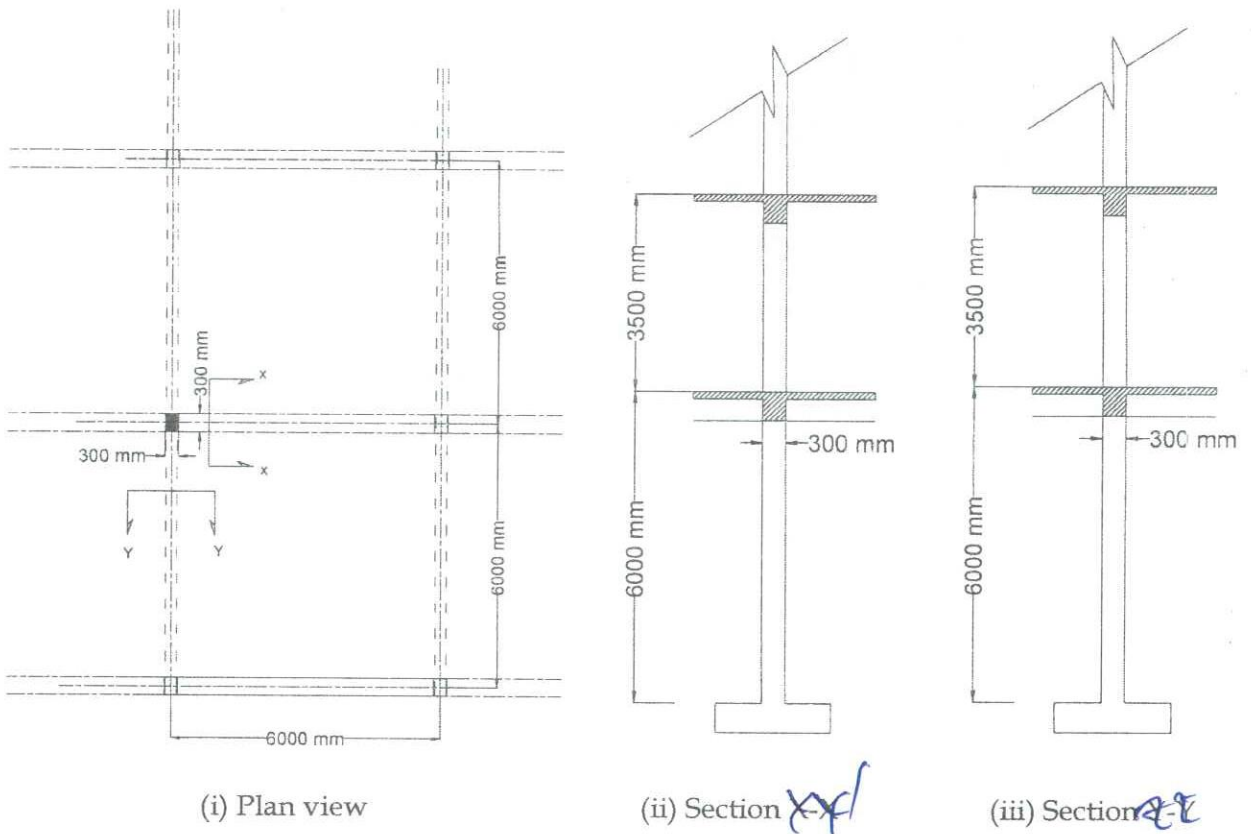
(a) Plan view and cross sections of the ground floor and first-floor columnn
